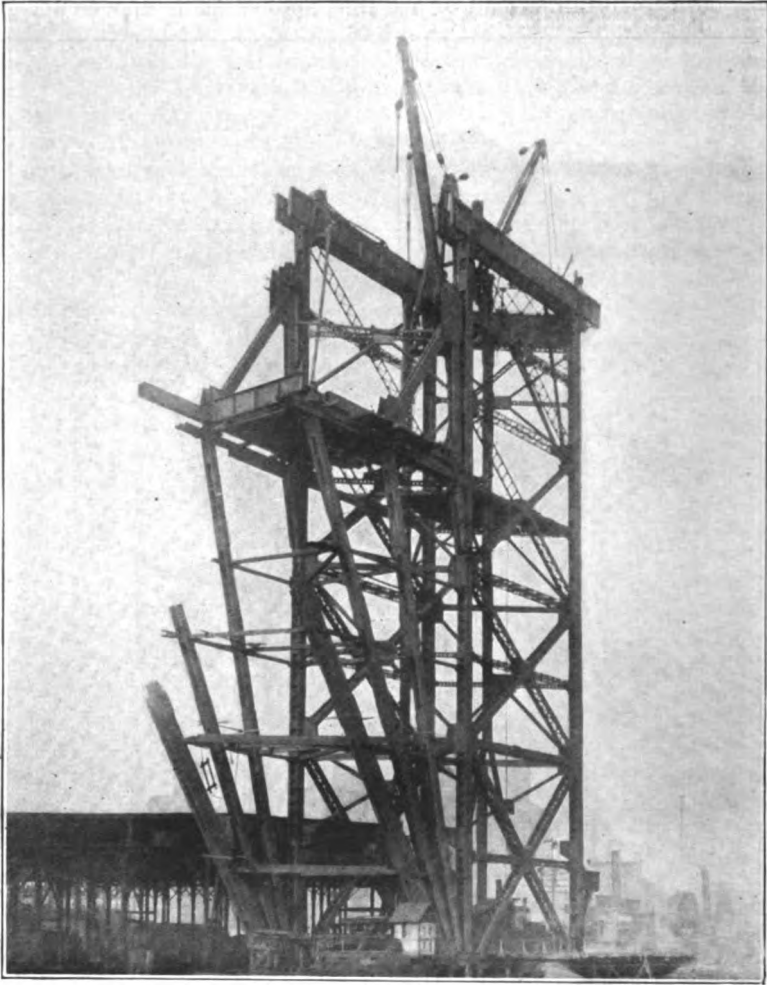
Showing End Panels of Lift Span and Part of Fan False Work Erected.
